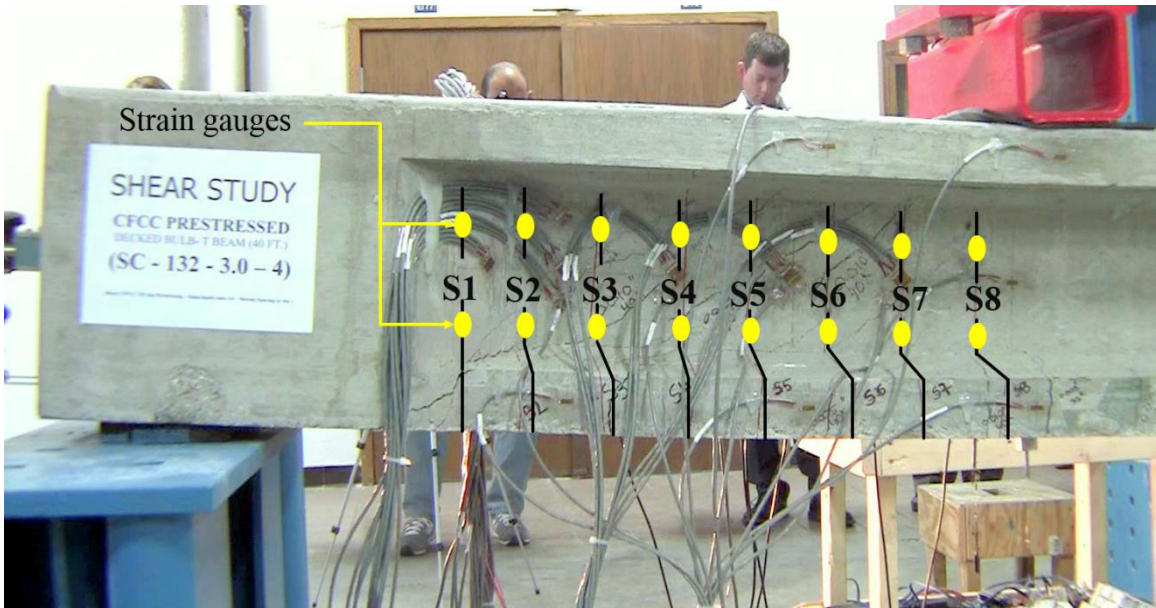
Location of internal strain gauges on CFCC stirrups of Beam C-C-S-B
